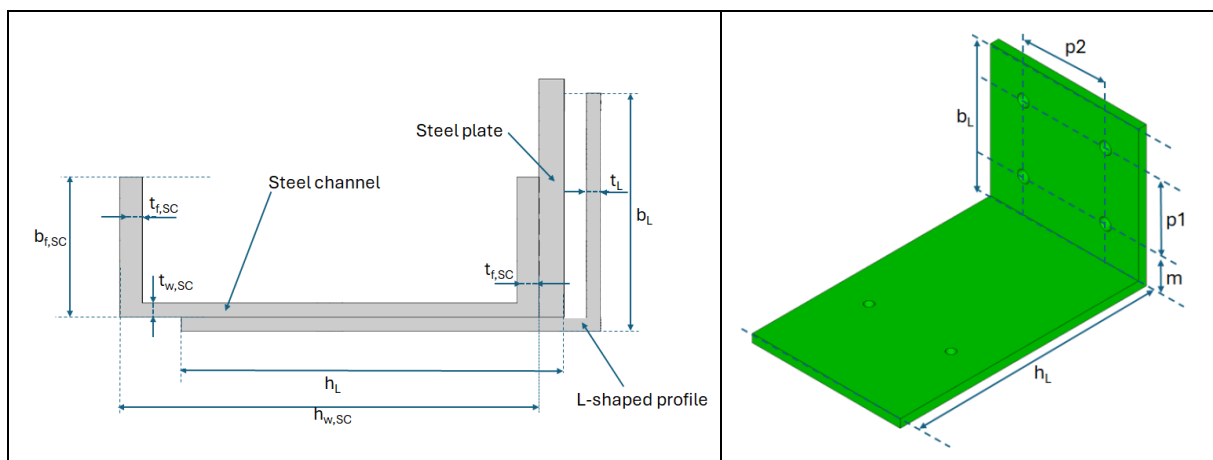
Definition of geometrical dimensions for the fusible link n°3
